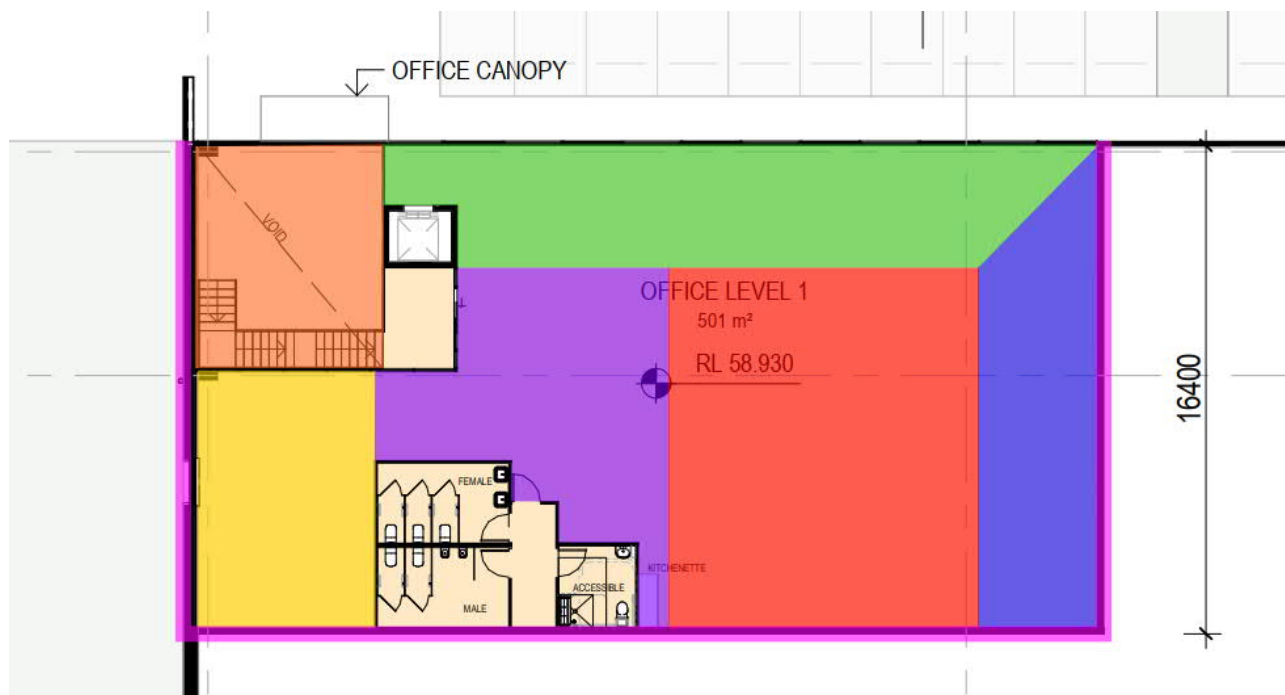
HVAC zones & thermal envelope for 1500 Centre Road First Floor
